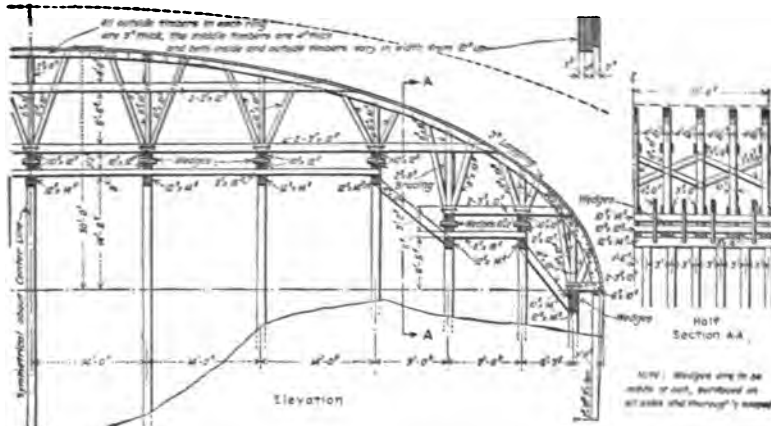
Falsework for bridge over Big Muddy River, I. C. R. R.
